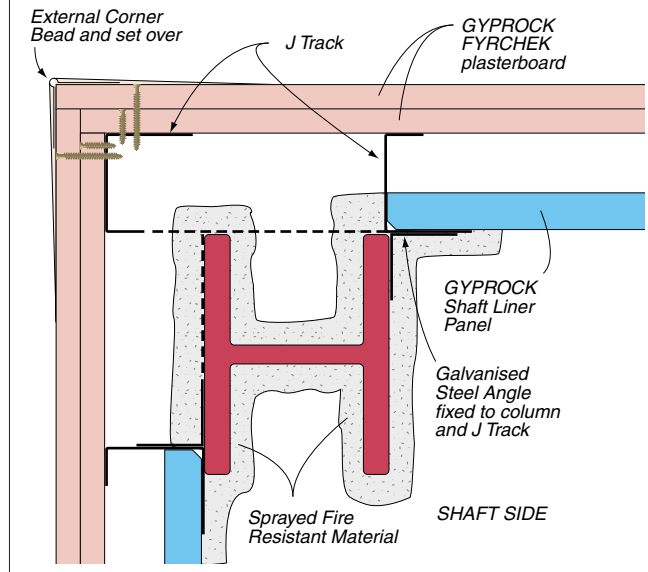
WALL JUNCTION AT UNIVERSAL COLUMN
